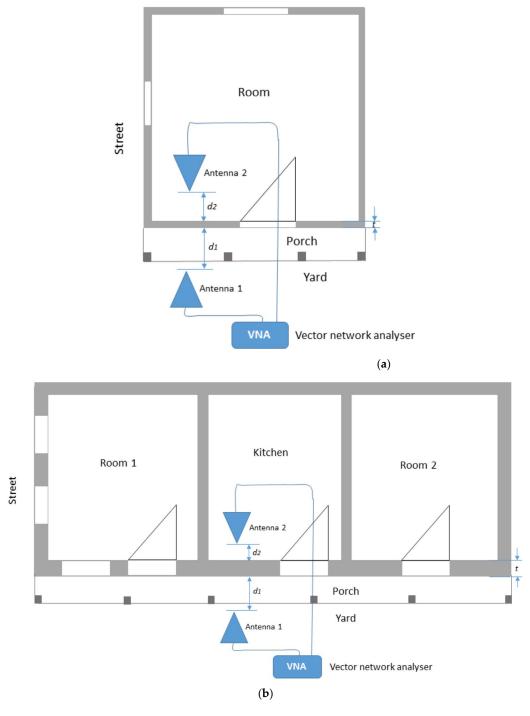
Floor plans of traditionally constructed houses: (a) a single-room wooden house; (b) a three-room house made of raw and baked bricks and rammed earth, including a measuring system.
